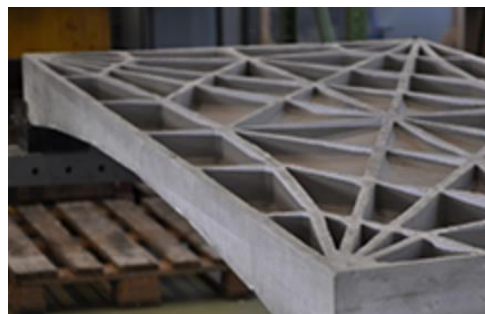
Lightweight concrete plate* (Empa, n. d.)
